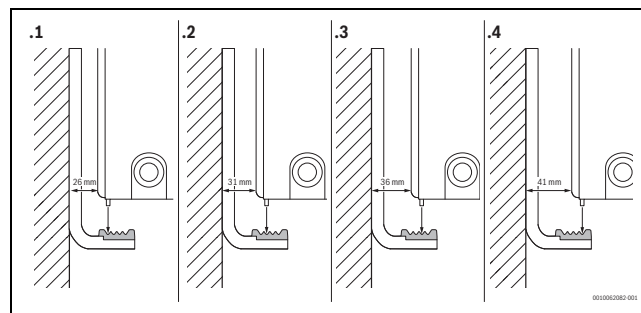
Wall bracket attachment options for Type 21, 22, 33 of VC-, VCM-, A- and C-Profil/ Plan radiators
